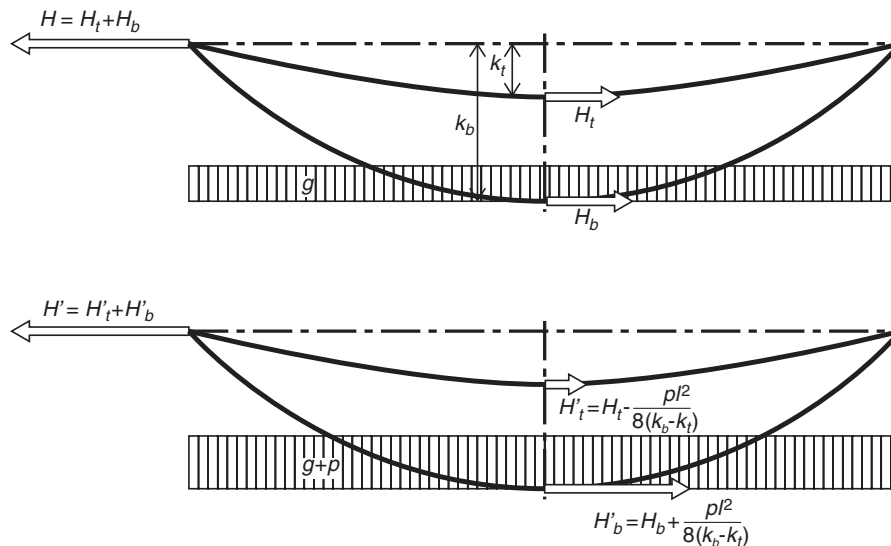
Double main cable system subjected to dead load (top) and dead load + traffic load in one span (bottom)
